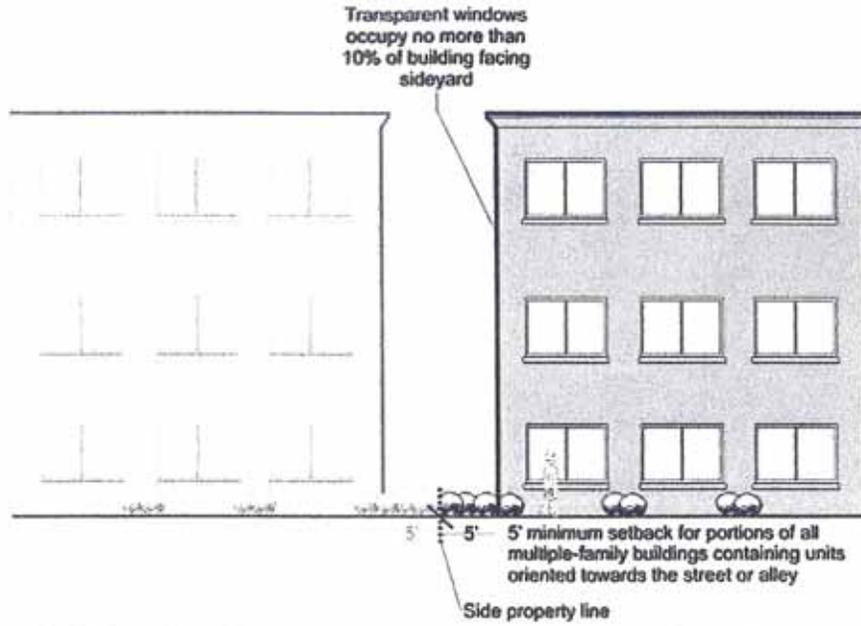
Side yard standards where dwelling units are oriented toward street or alley.
